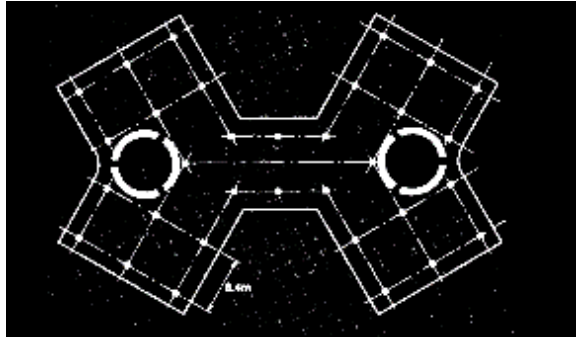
Loma Prieta 1989: 8-story Escondido Village Buildings [79]
